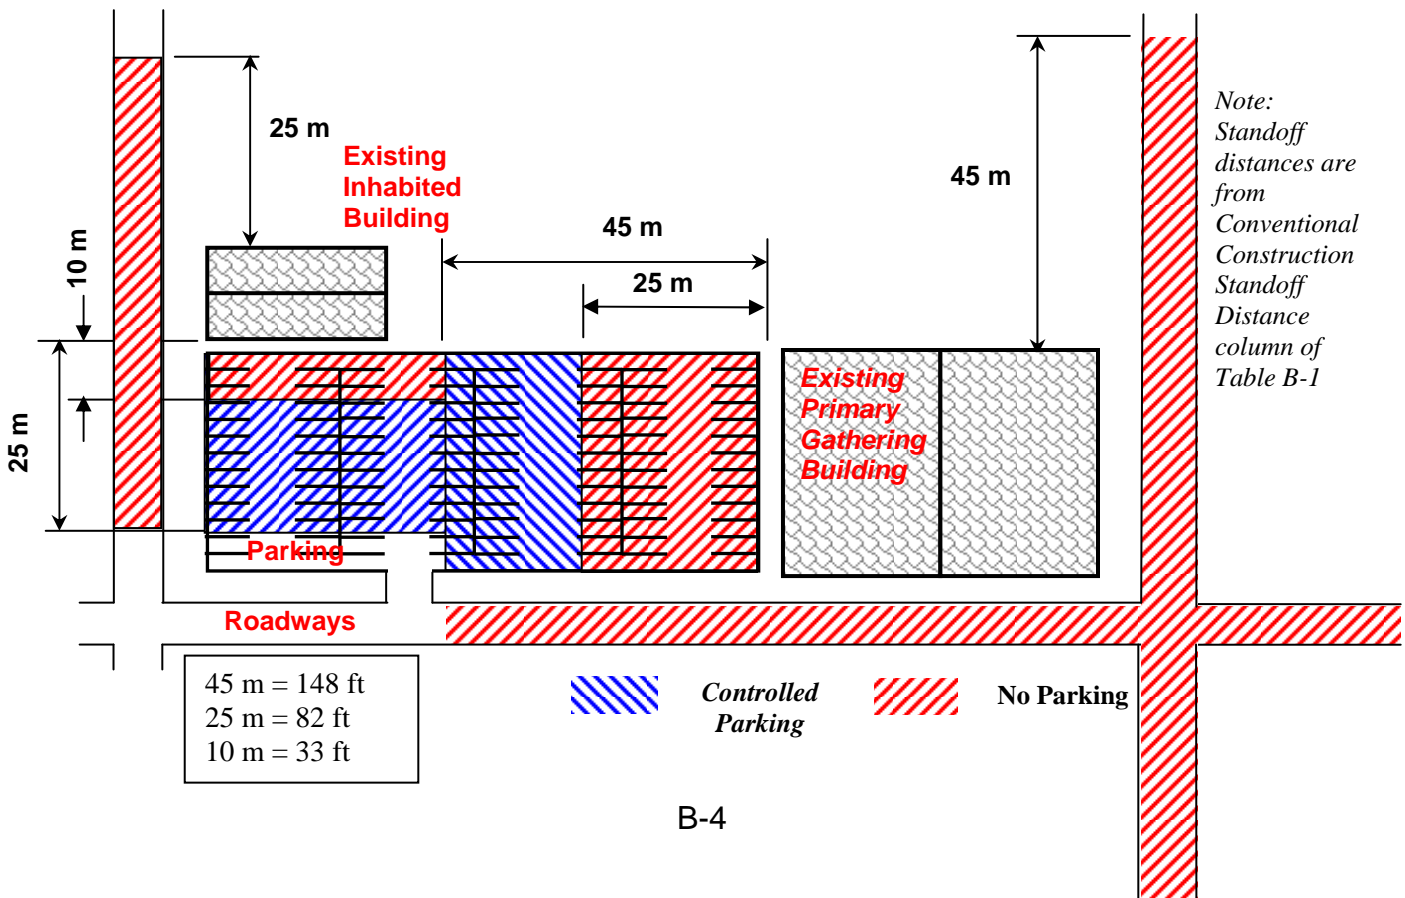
Parking and Roadway Control for Existing Buildings – No Controlled Perimeter
